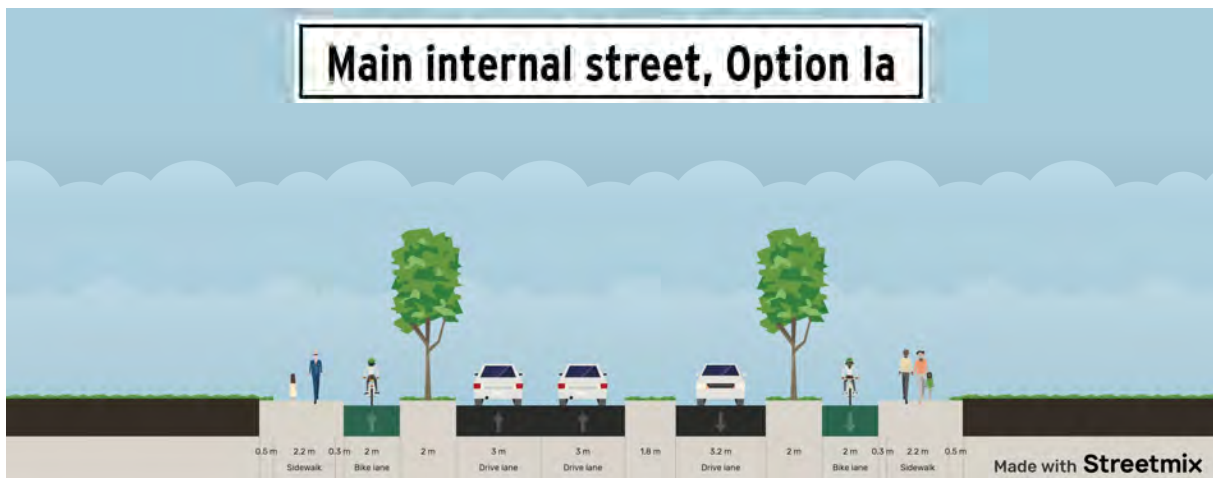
Main internal street variant on the approach to Carrington Road (example layout)
